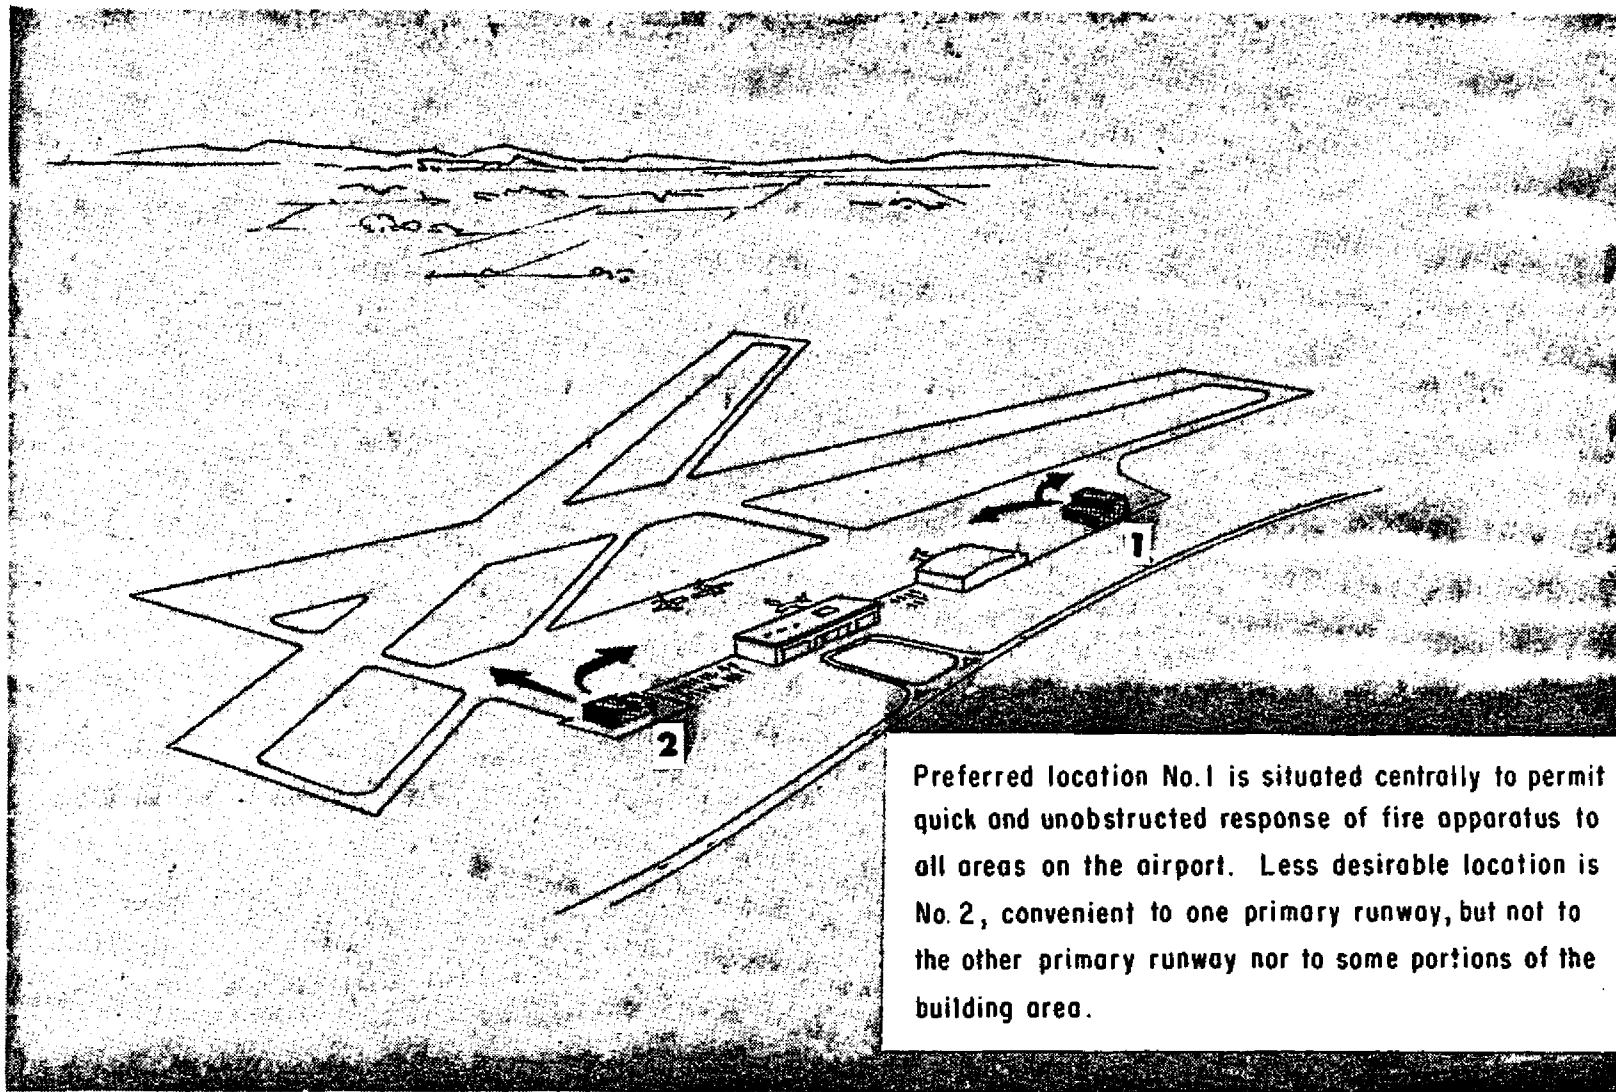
TYPICAL FIRE BUILDING SITE LOCATION
